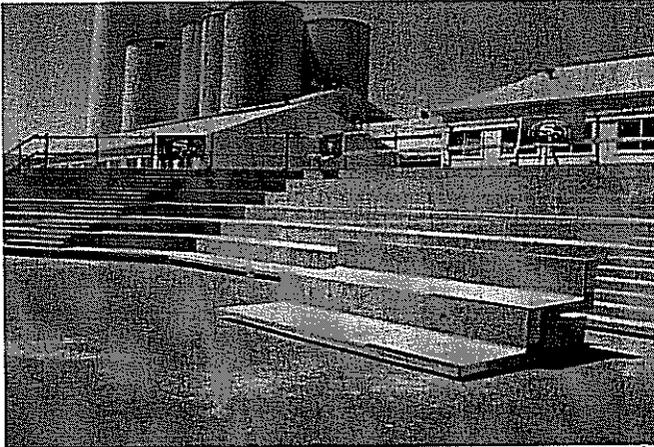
Mockup of the concrete structure that will go into the new 49ers stadium Clark Pacific has the contract to supply the precast concrete
